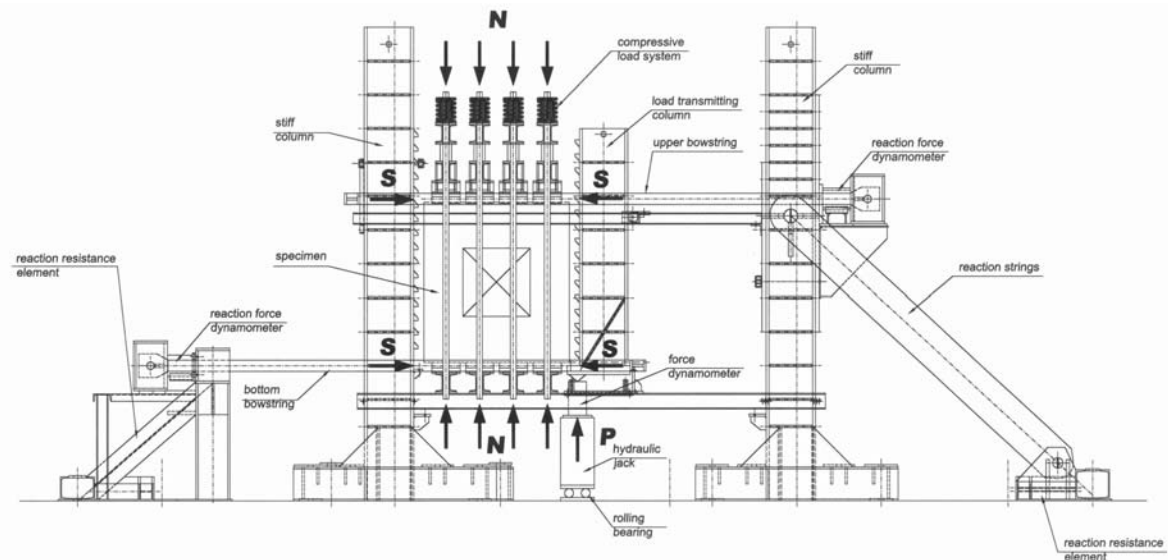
General view of the test stands for investigation of models with prestressed part of wall
